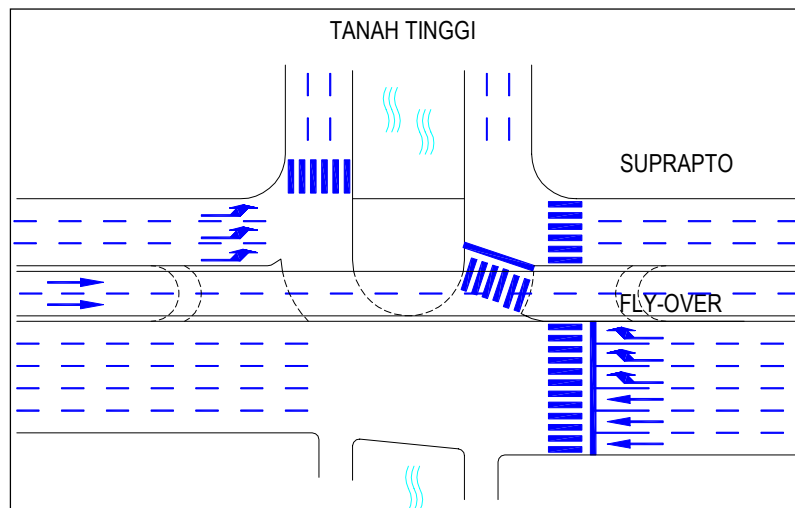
Existing Layout at Suprapto – Tanah Tinggi Intersection
